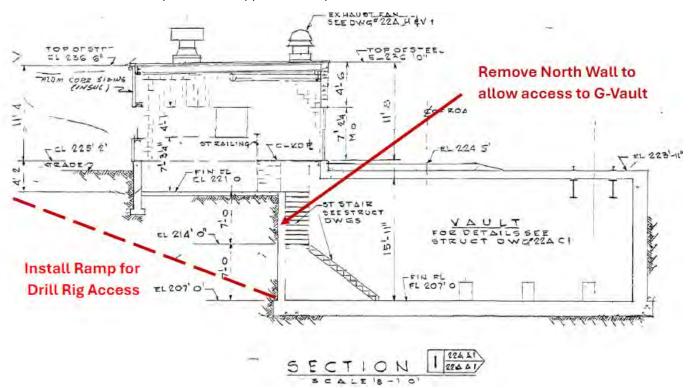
Pitch Pump House G-Vault Access for Sample Collection -Drawing 190023-A
